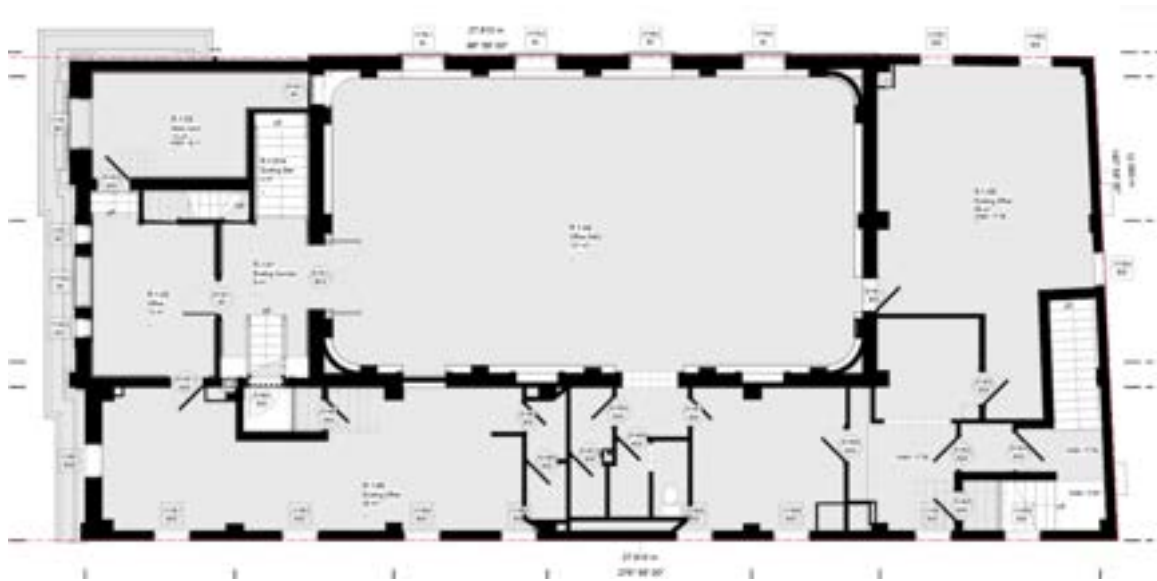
A1-103 Existing first floor plan. Source: Trethowan Architecture, 2025.
